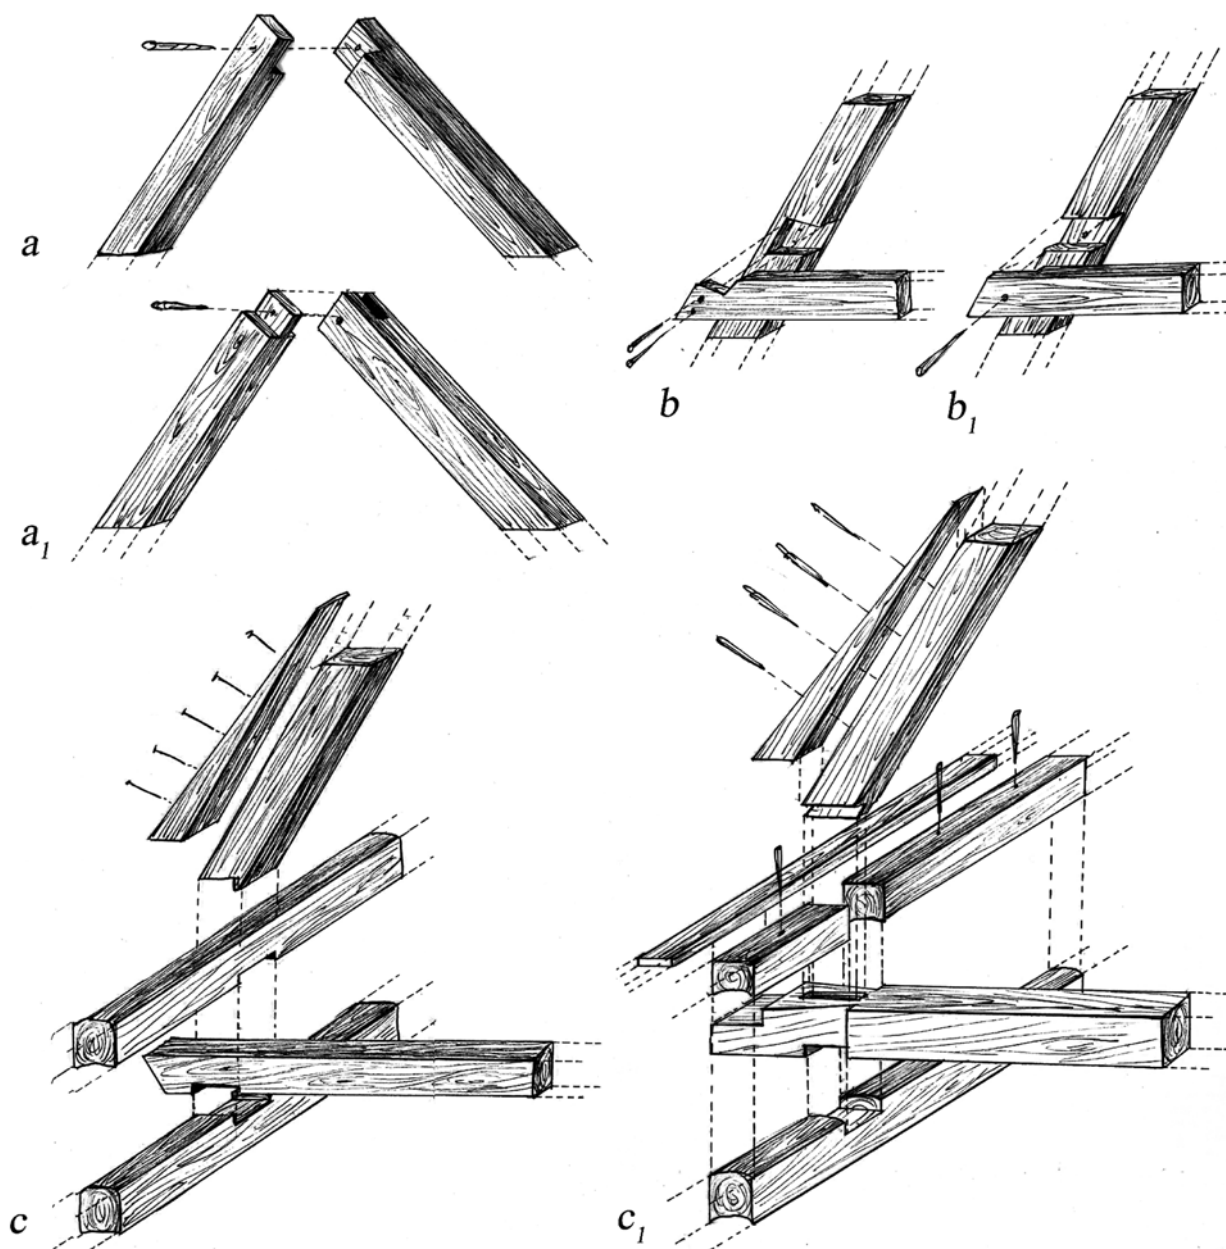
Technological analysis of the truss; special structural nodes a1 – “rafter-rafter” connection, b1 – “collar tie-rafter” connection, c1 – “rafter-ceiling joist” connection (designed by L. Berežanskytė)
